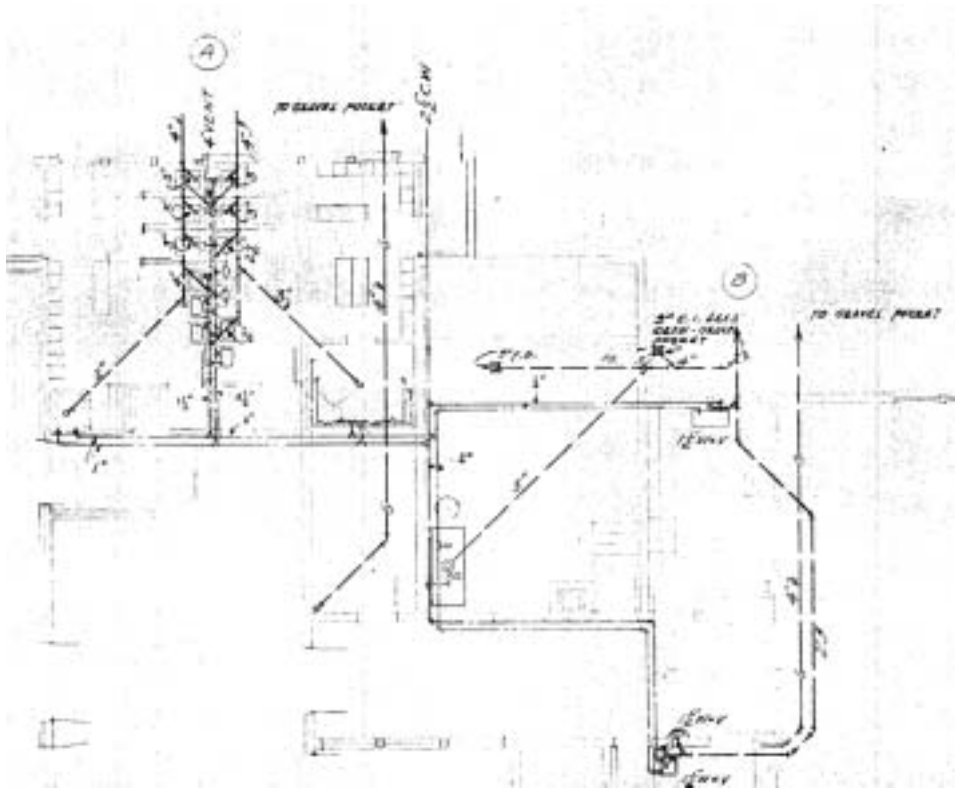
DETAIL OF INTERIOR AND EXTERIOR FIXTURES. UNDATED DRAWING COURTESY OF THE WASHINGTON MILITARY DEPARTMENT.
